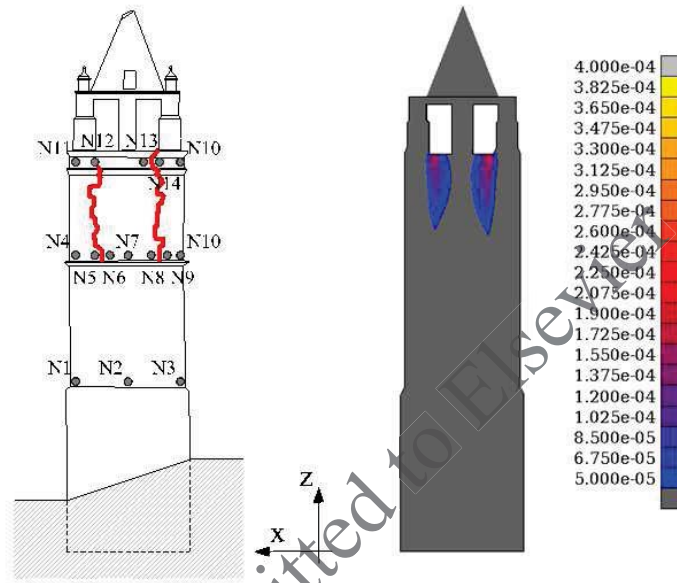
Mogadouro tower North façade, surveyed (on the left) and numerical (on the right) cracking pattern.
